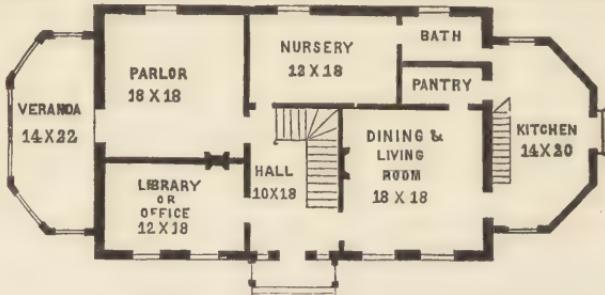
PLAN OF BATTENED COUNTRY HOUSE.
